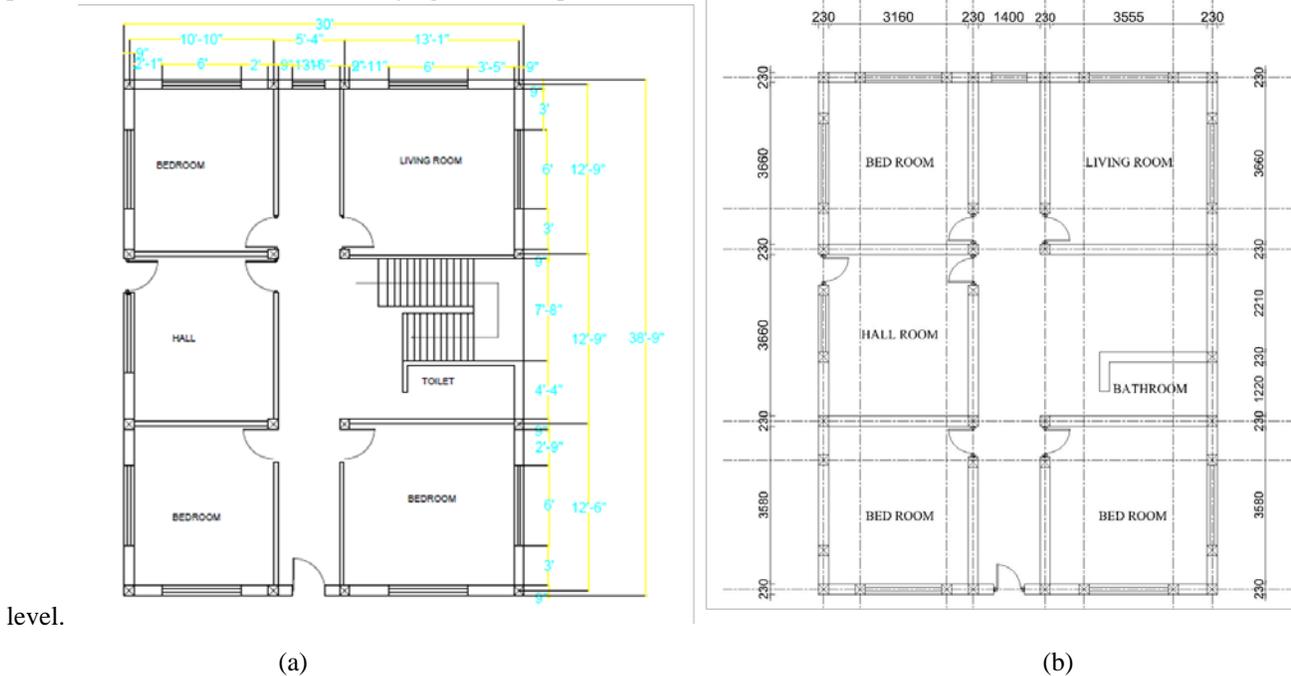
Floor plan of Building 2: (a) Original RC frame with infill (b) Equivalent confined masonry
